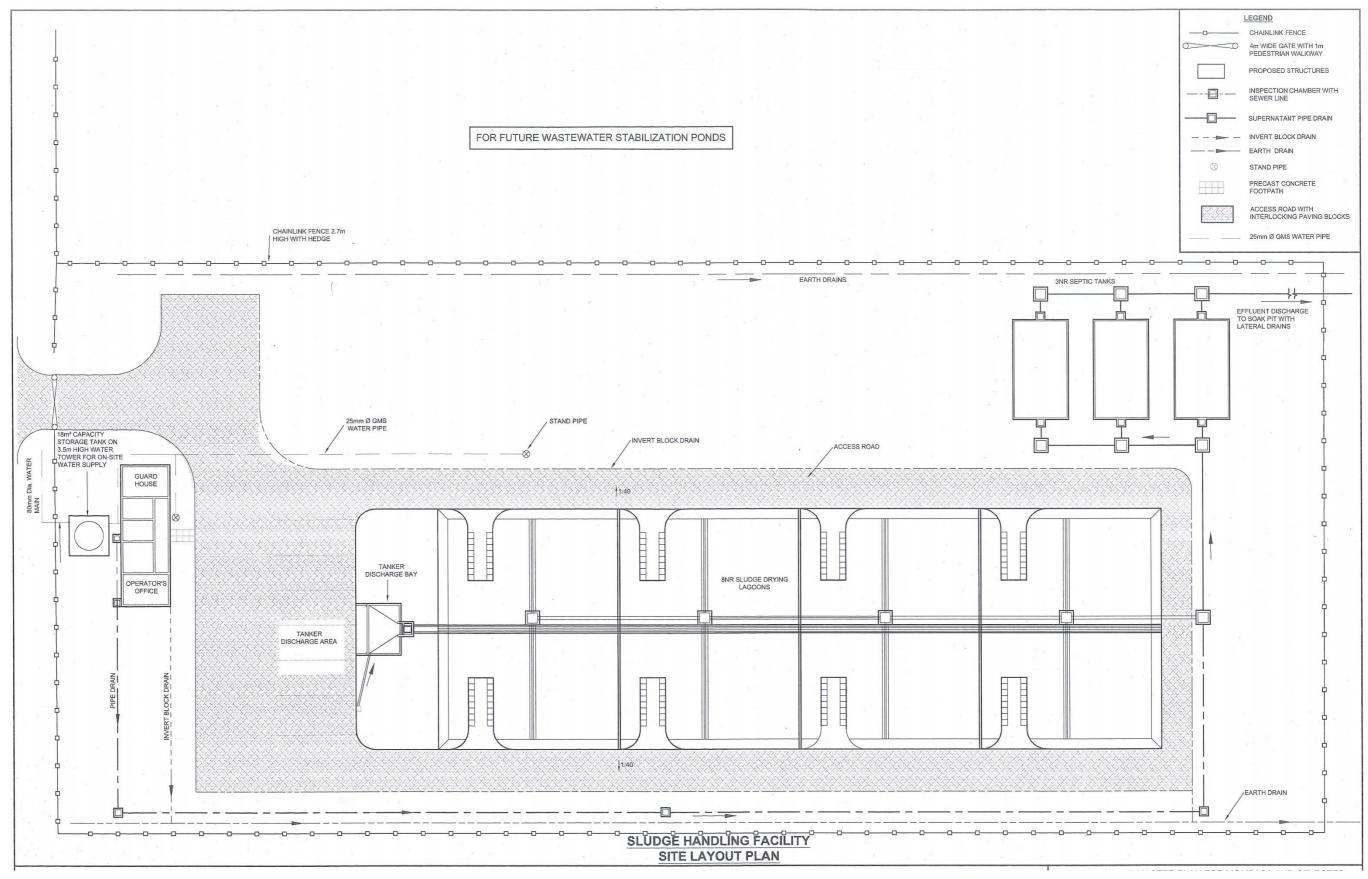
Schematic Layout Plan of the Proposed Sludge Handling Facility
